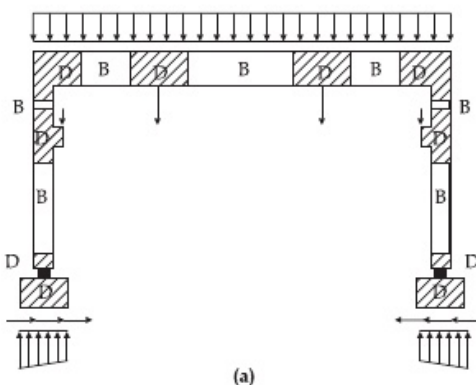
Definition of B and D zones for a reinforced concrete structure [SCH1984]
